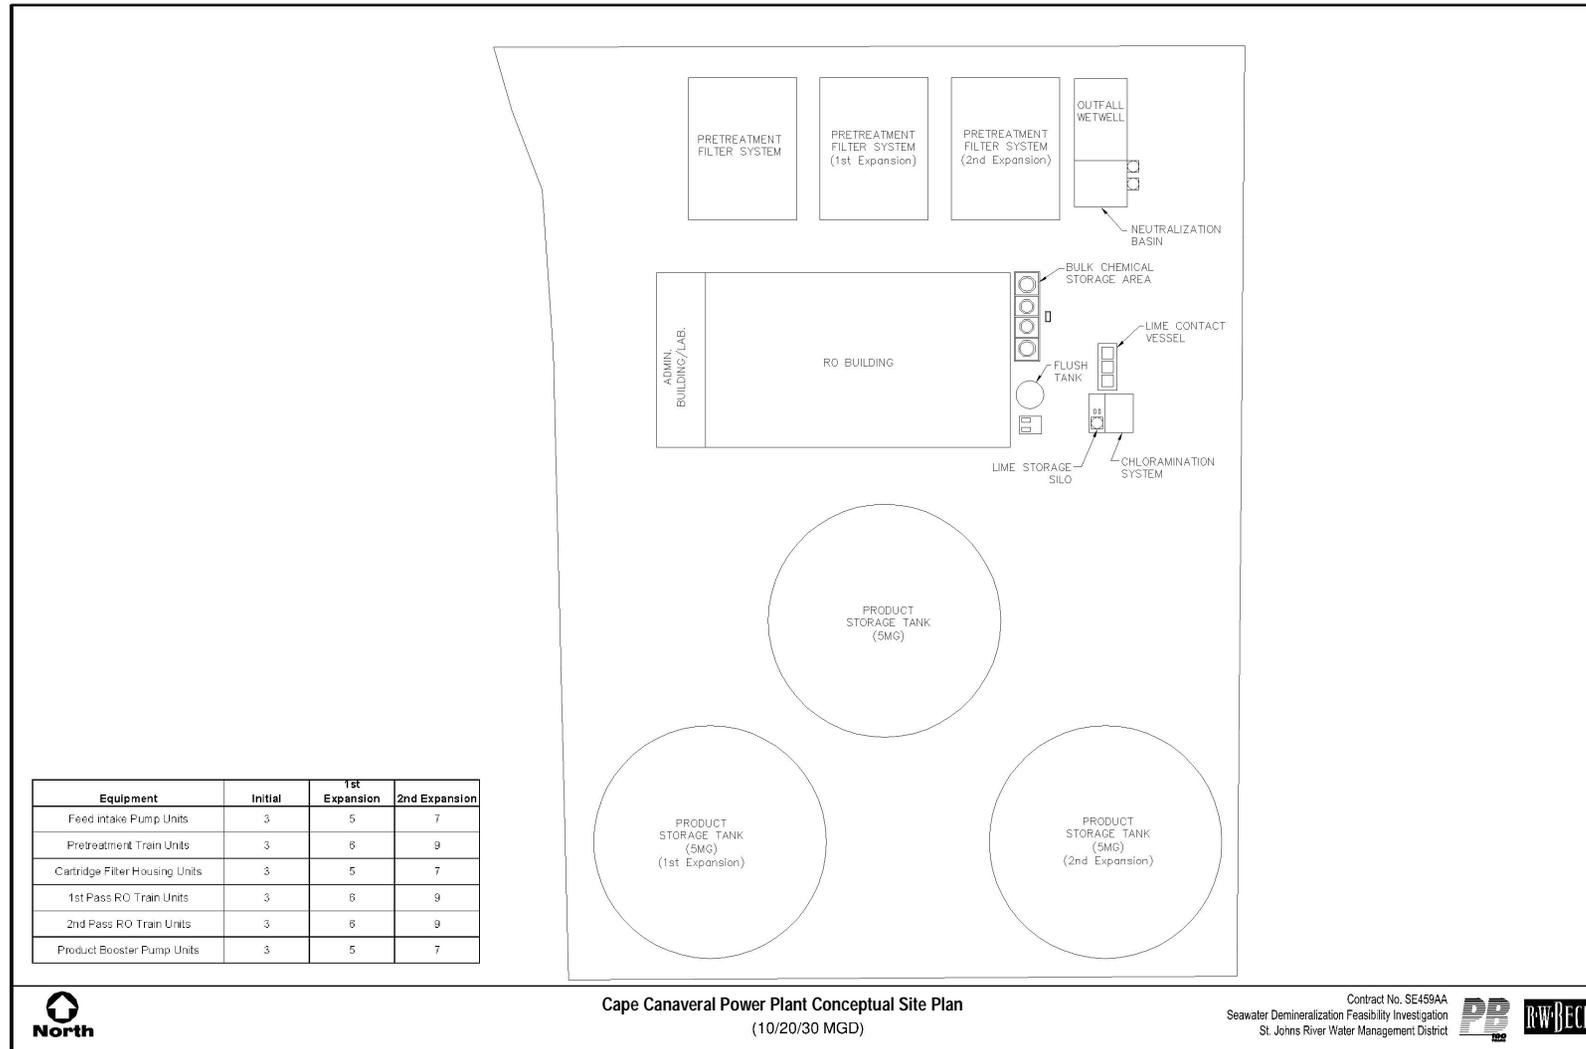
Cape Canaveral Power Plant Conceptual Site Plan
